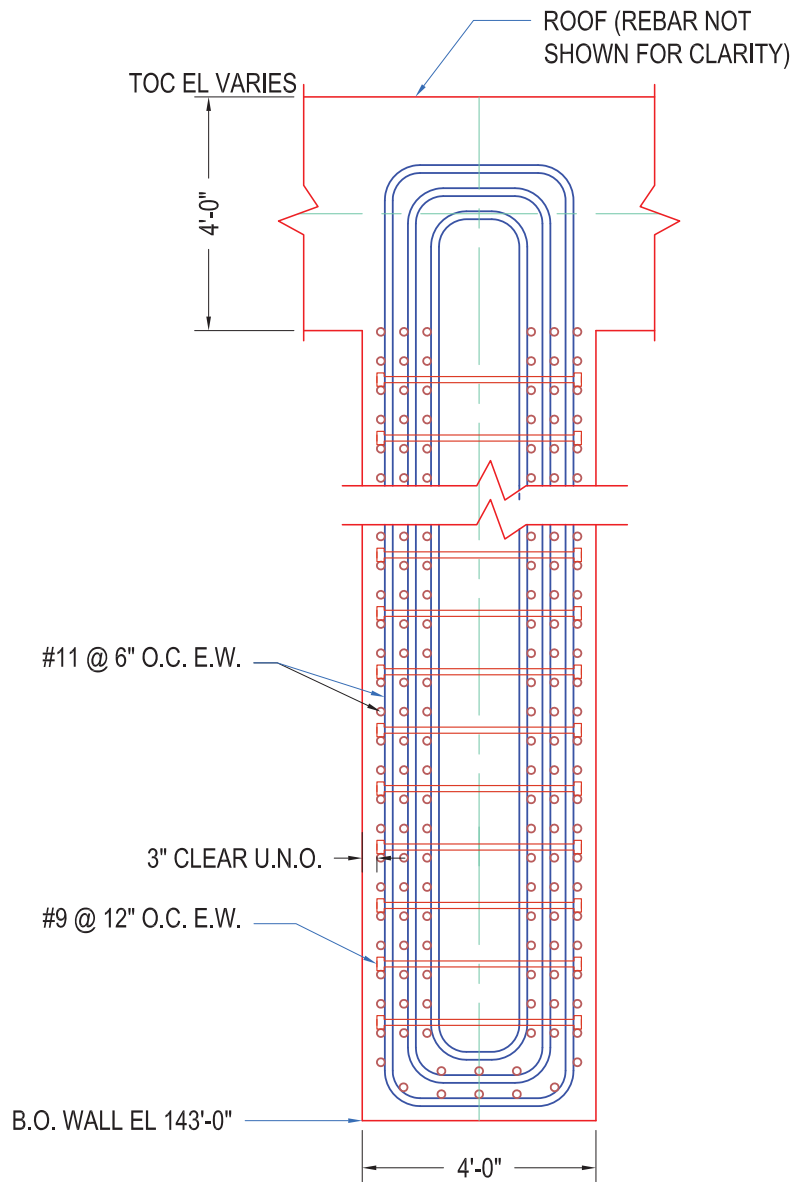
B-20: RXB Reinforcement Section View of Upper Stiffener Wall on Grid Line 6
